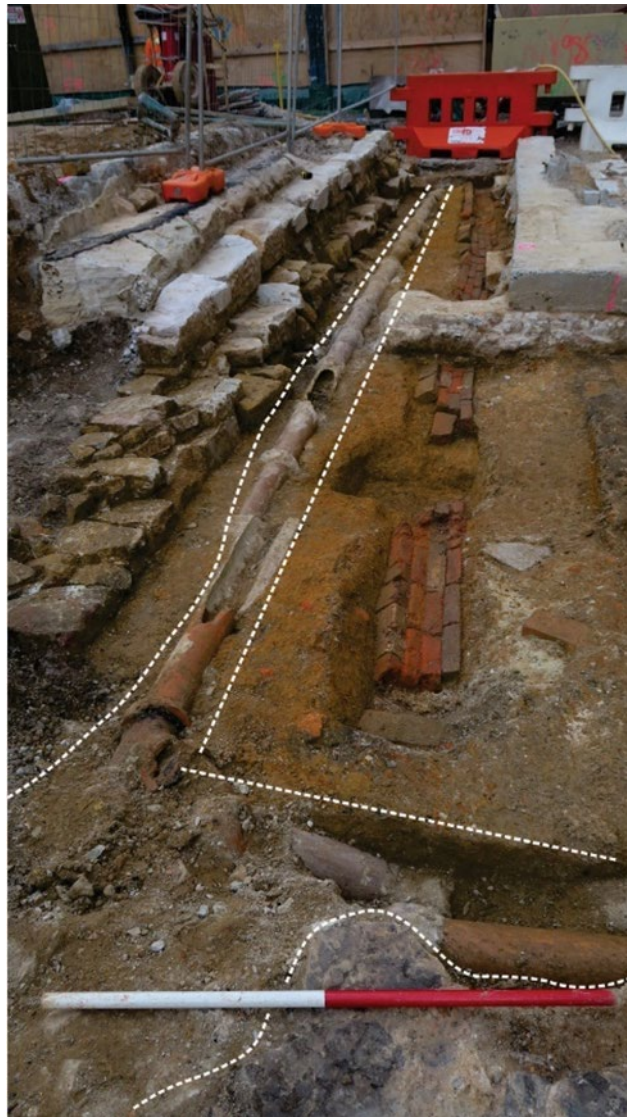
The brick footings of the orchestra pit (right). View to the south, 1m scale. IMG\_0890.
